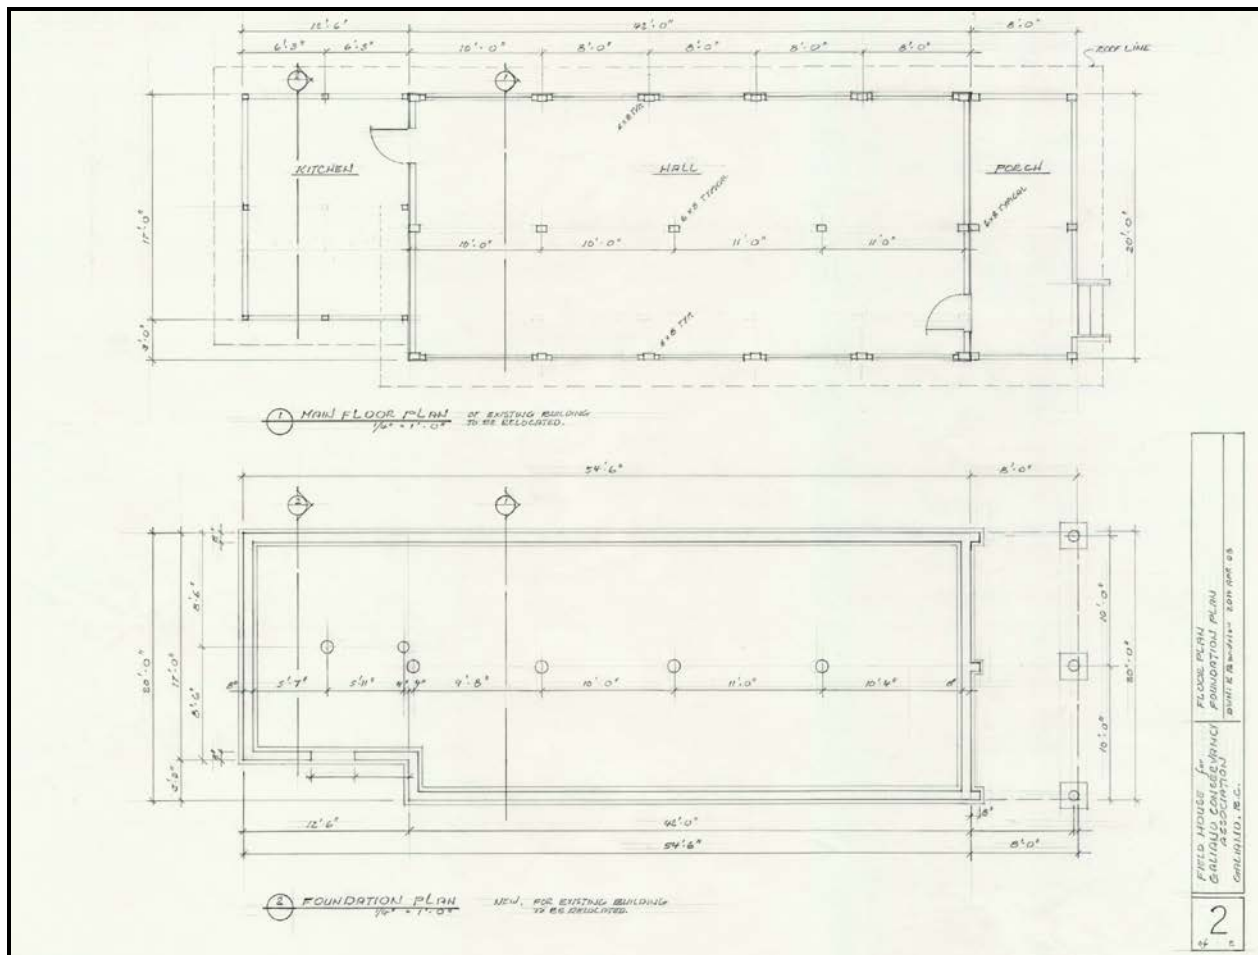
Kitchen/Dining/Classroom Building (floorplans)
